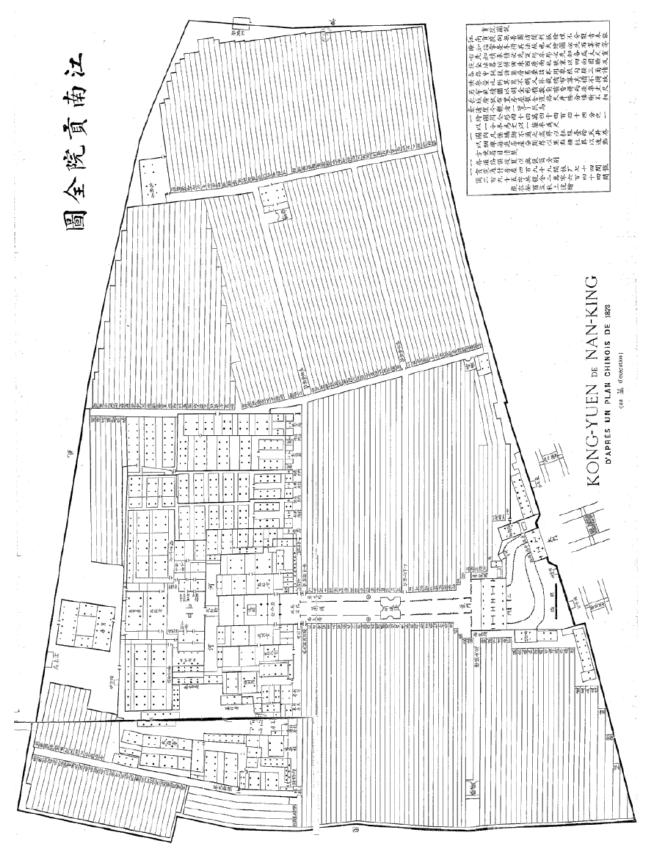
Plan of Jiangnan Exam Hall, 1873
